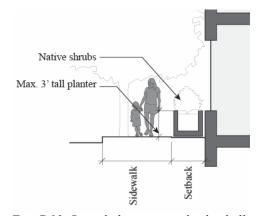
Raised planters in setbacks shall not be taller than 3'.
